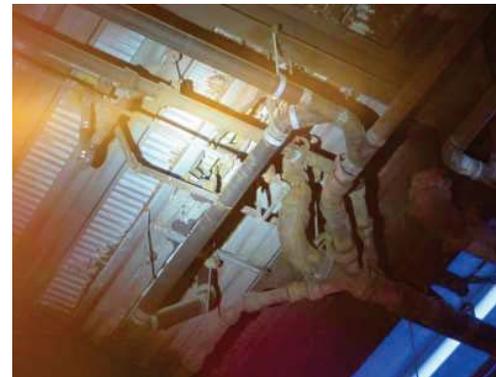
Deteriorated decking and sub-decking at plumbing penetrations servicing a toilet facility in a sideline seating stand.
